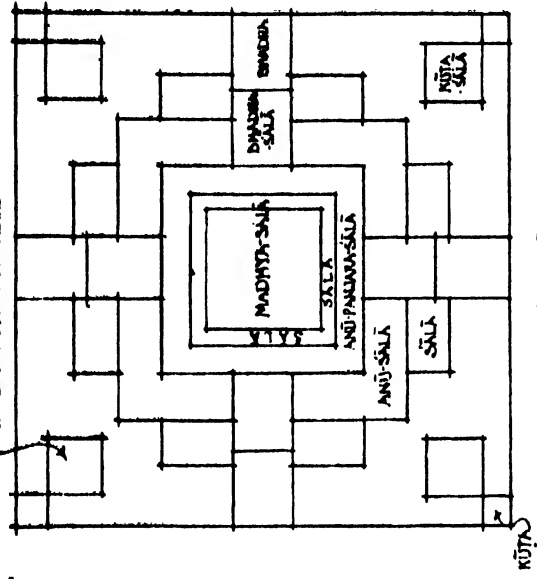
INTERMEDIATE SIZE — 50 PARTS
